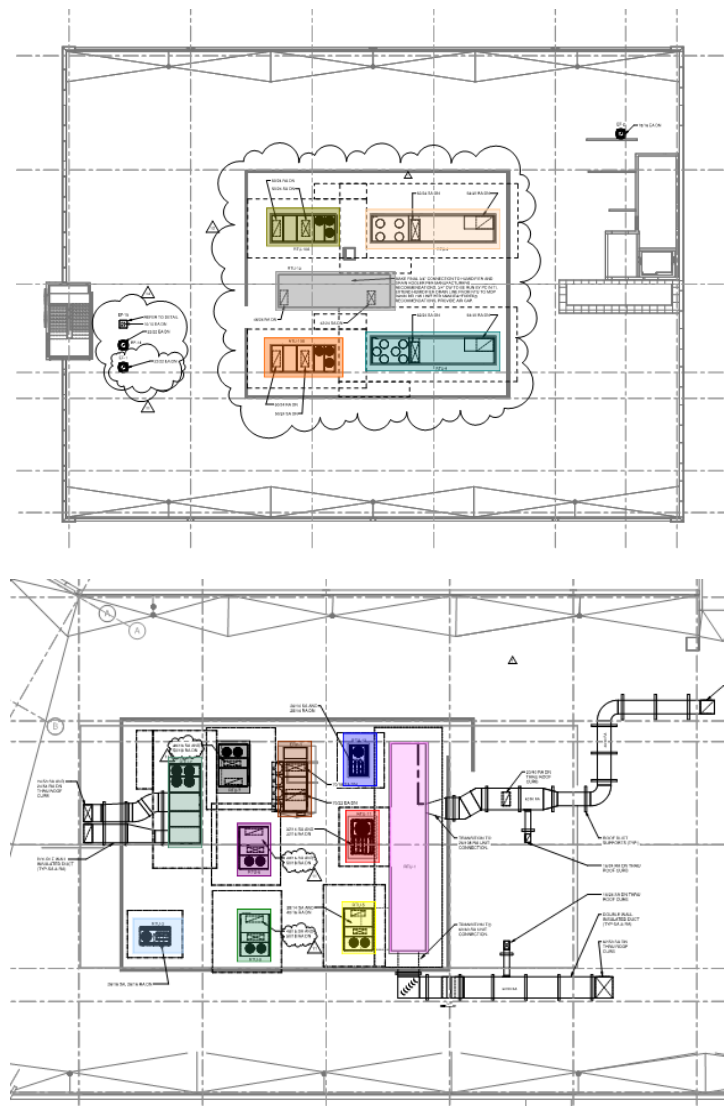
HVAC ROOF PLAN (WEST, EAST)
